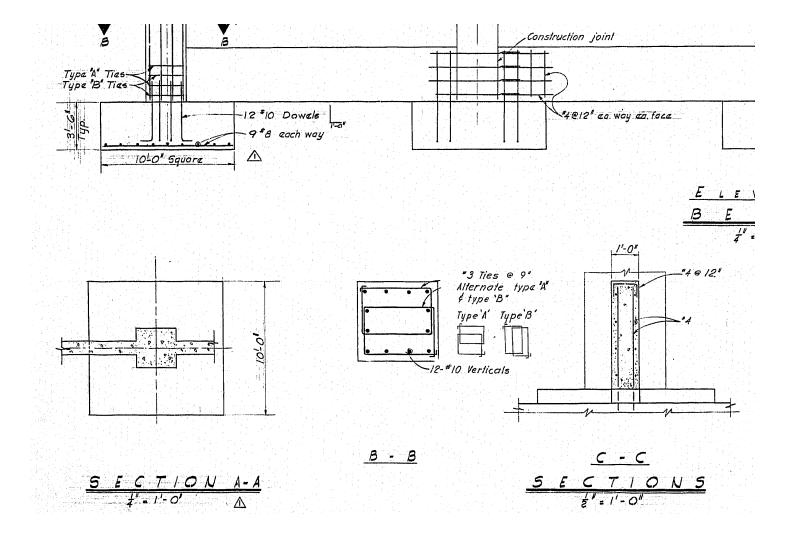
Bents 2, 3, 4, 7, 8, 9, 10, and 11 spread footing with no top layer of reinforcing in footings. Only Bent 2 with short 1ft wall at bottom of column
